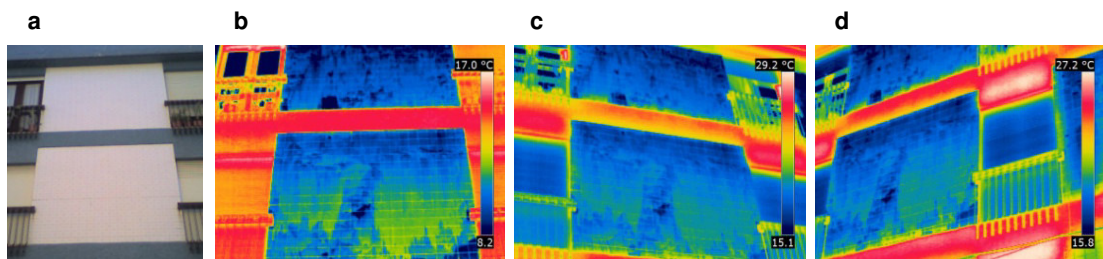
South-West facade of building D: a) photo of facade under their shadow; b) thermal image of the surface from a perpendicular angle (facade under their shadow); c) thermal image of the surface from an oblique angle (facade under direct sun radiation); and d) thermal image of the surface from the opposite oblique angle (facade under nearby building shadow).
